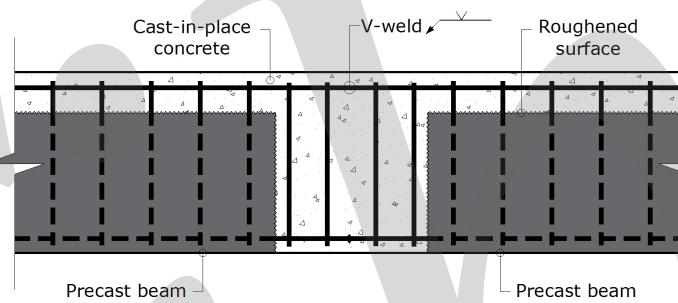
Beam-to-beam connection with welded bars
